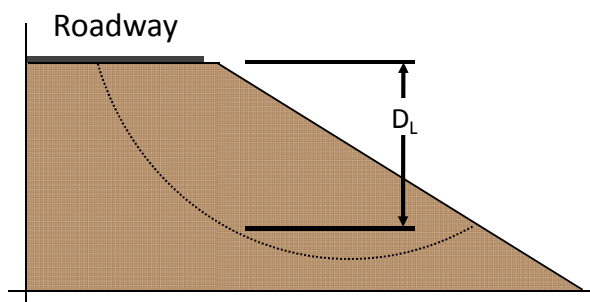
Roadway foundation undermined by landslide or flood hazards.
